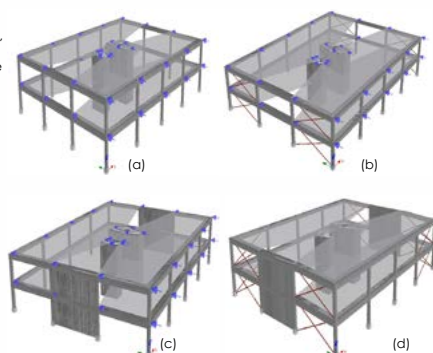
Building models with pushover loads assigned (a) unstrengthened (b) bracing retrofit (c) wall retrofit (d) wall and bracing retrofit
